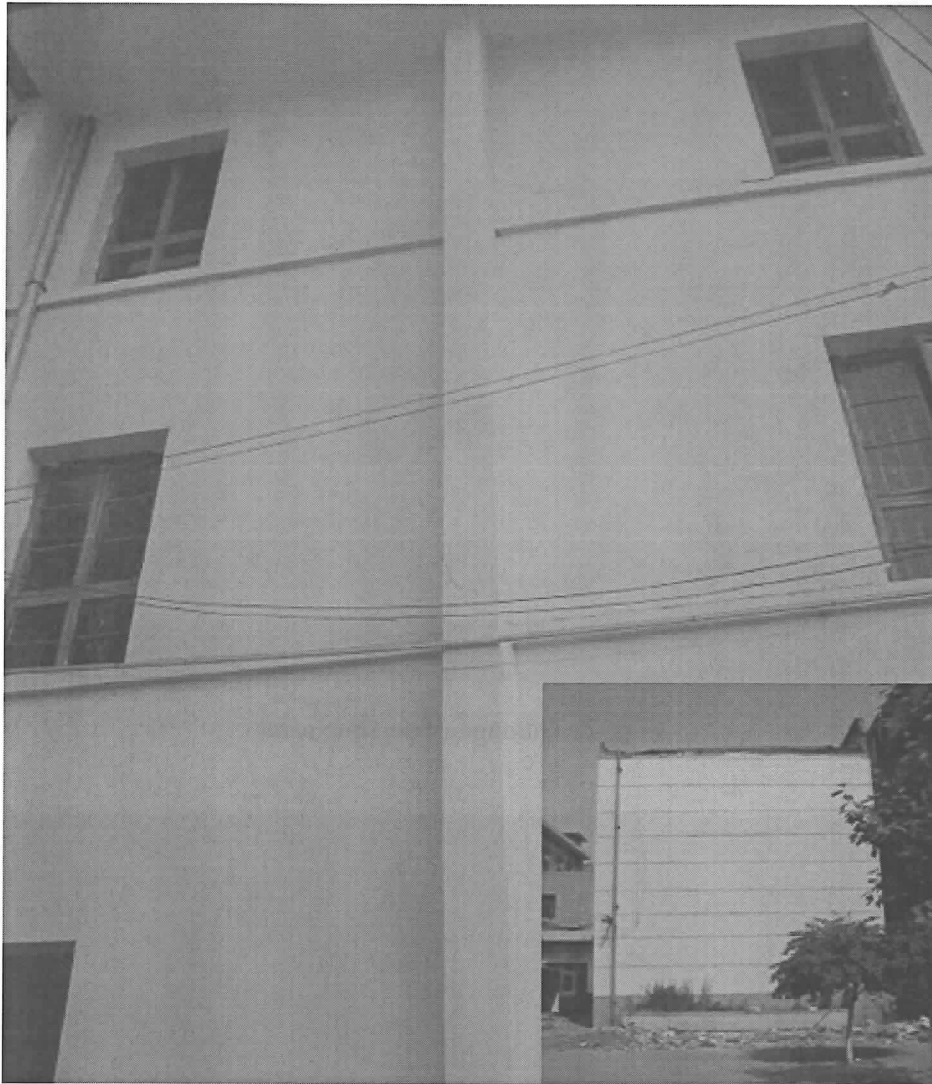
Damage of parapet wall and cracks in wall and column
